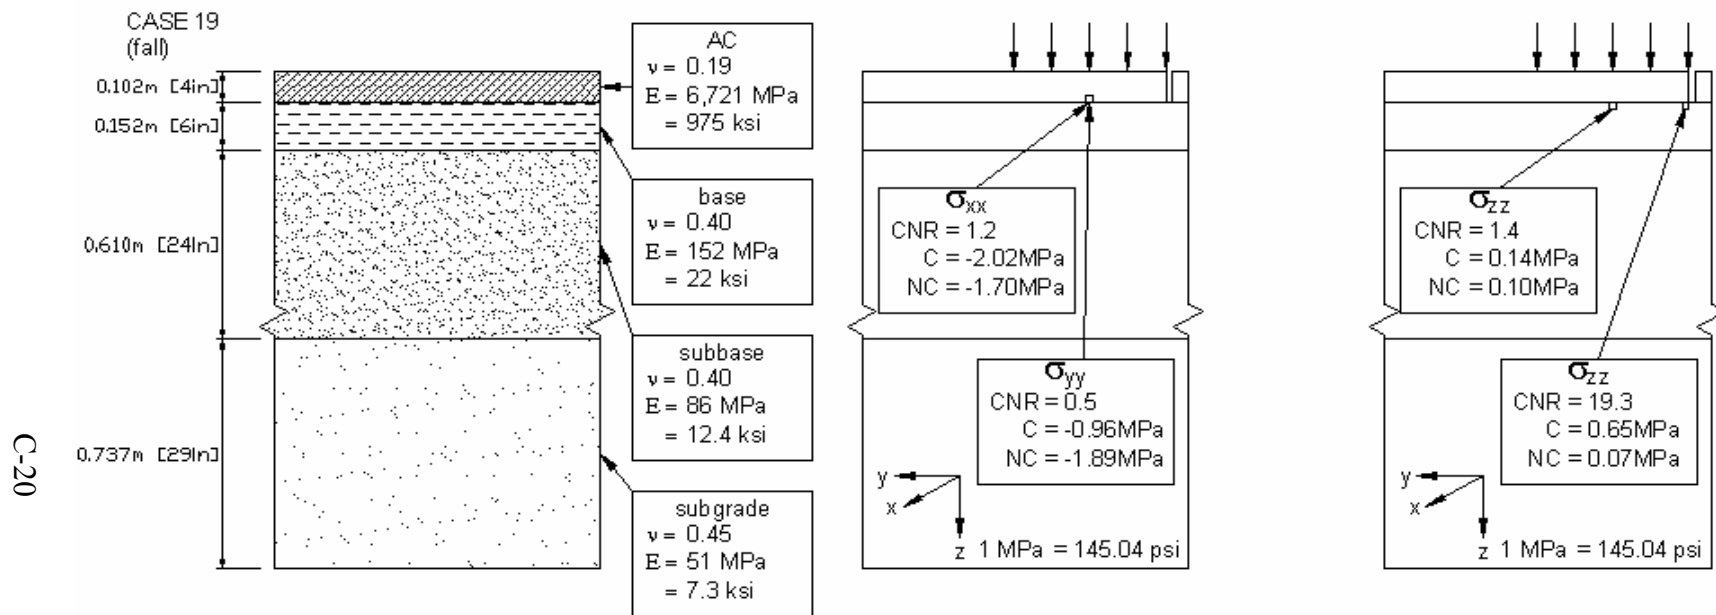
Summary cross section for case 19, (C – stress in cracked pavement, NC – stress in pavement with no crack, CNR – crack/no crack (stress) ratio)
